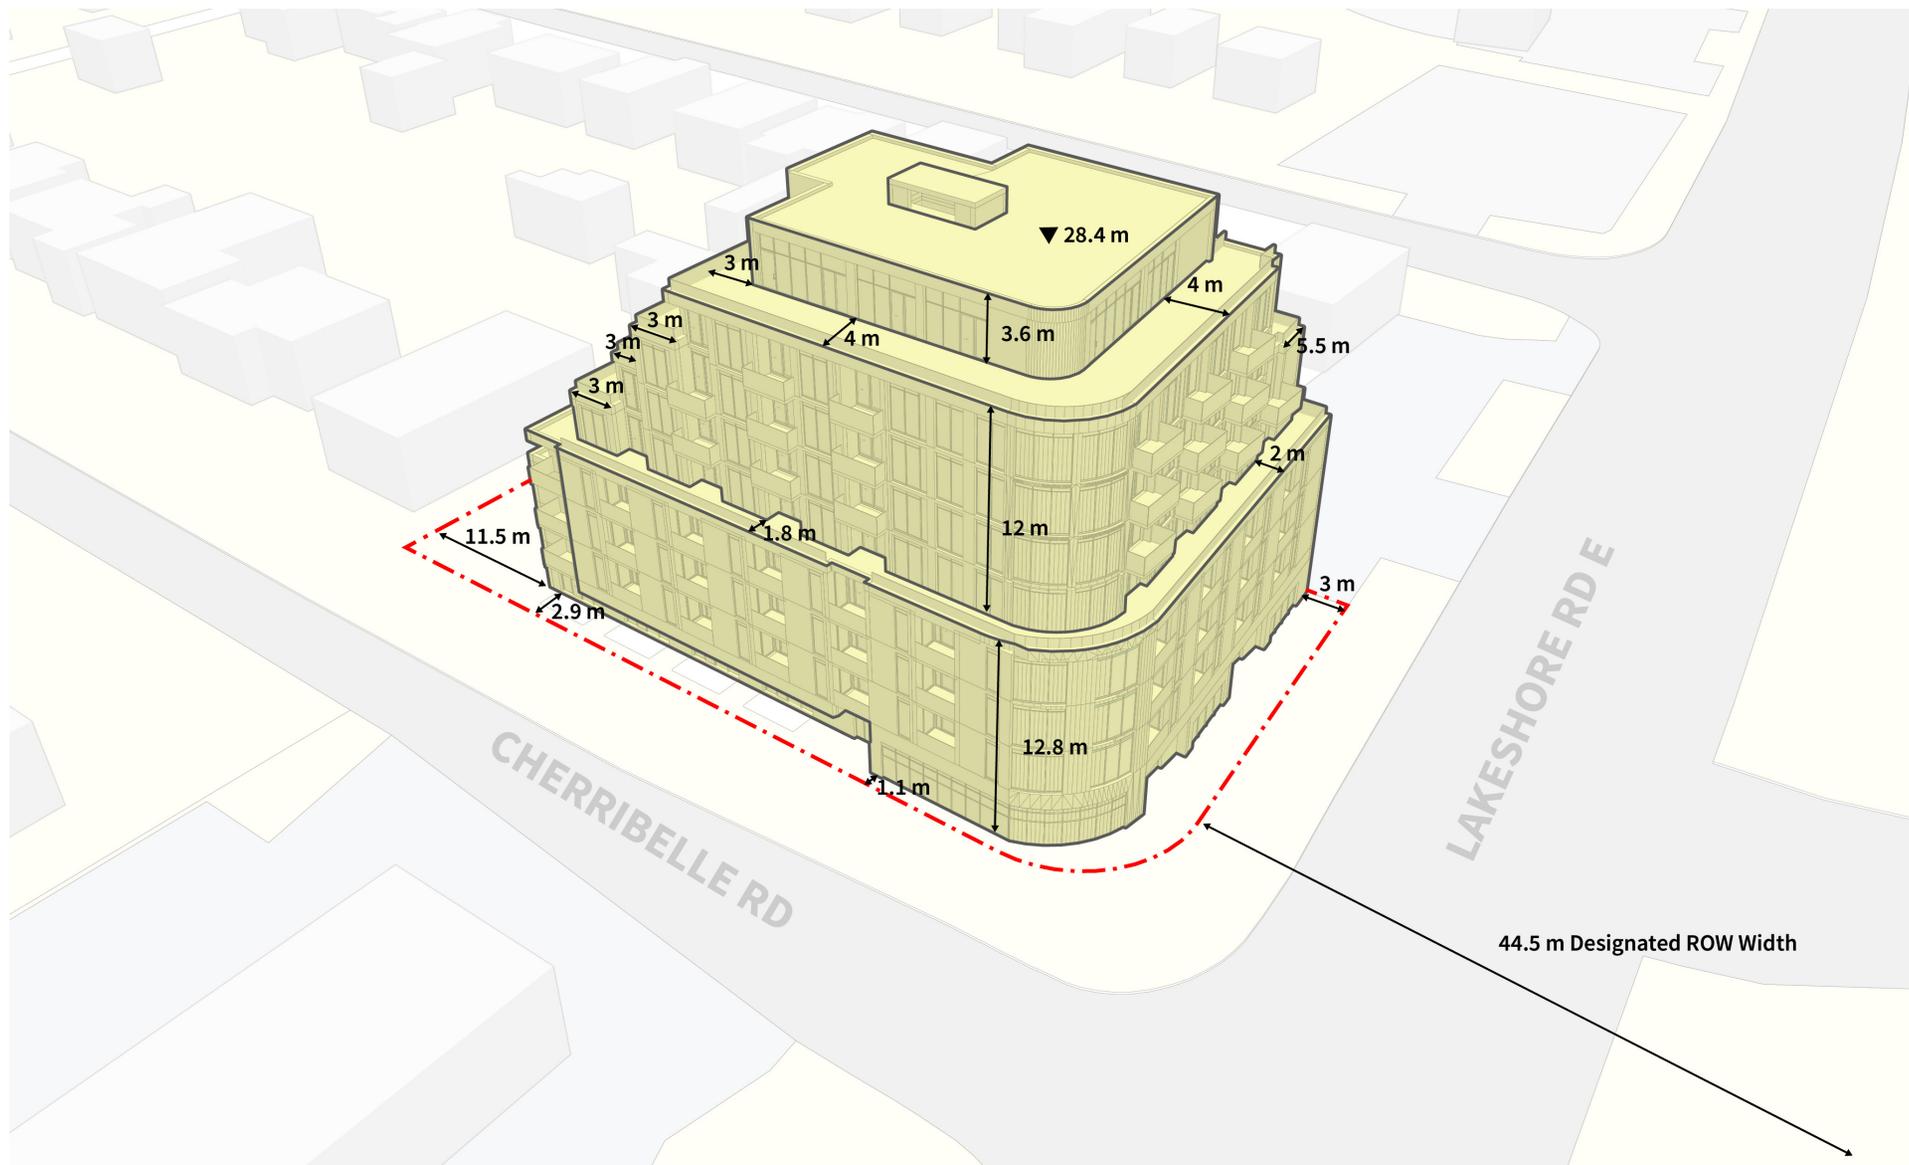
Perspective looking north of Lakeshore Road East, showing building dimensions
